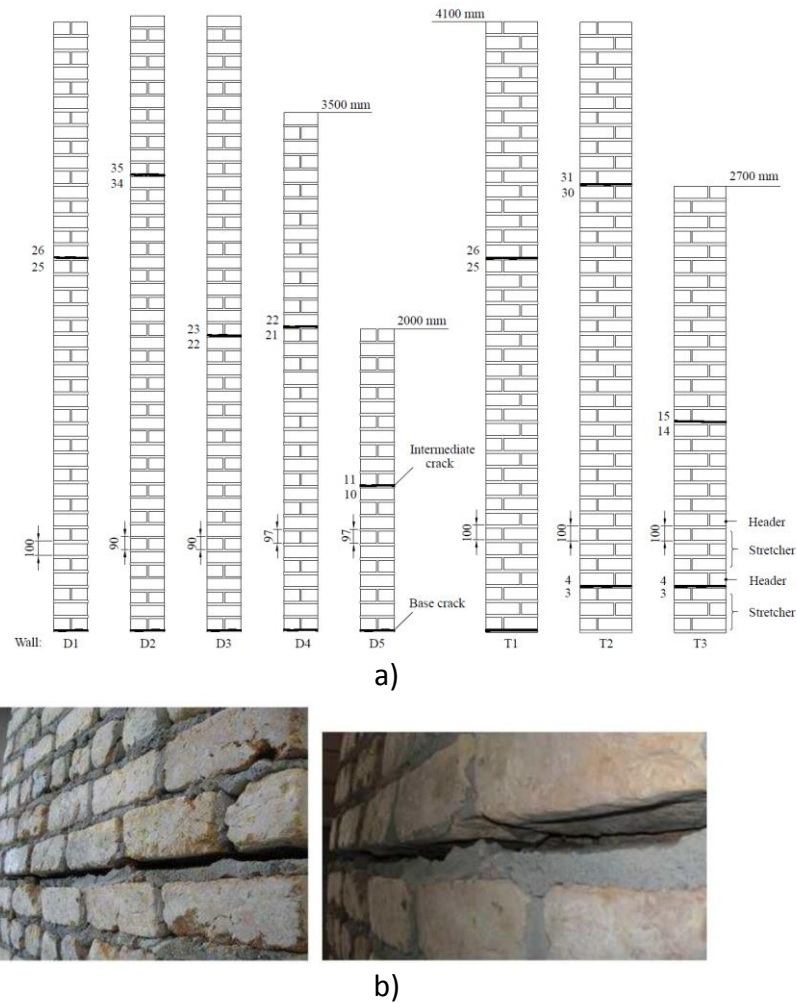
a) cracking development after applying the horizontal load , b) crack patten in walls at failure (Derakhshan, 2011)
